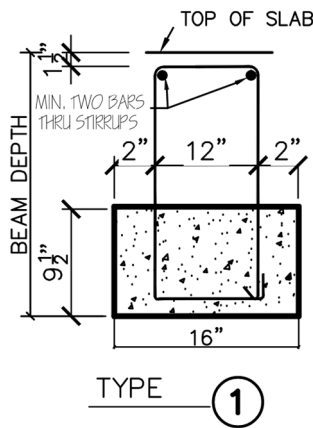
Cross-section of soffit beam (Sheet SC-3C-D of Submittal 328) showing 1.5 inches of cover to the transverse reinforcement
